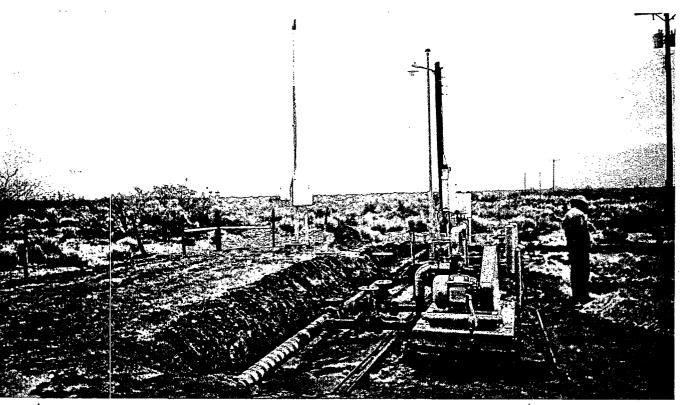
View looking east at pump areas showing limits of initial excavation. (photo by RJN 5/28/99)
